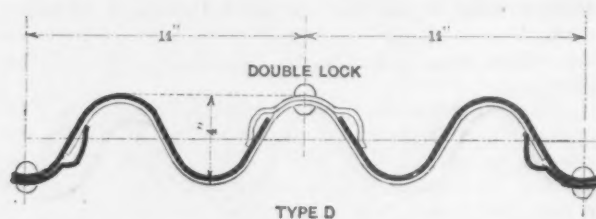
Cross Section of Wemlinger Steel Sheet Piling with Center Interlock.
